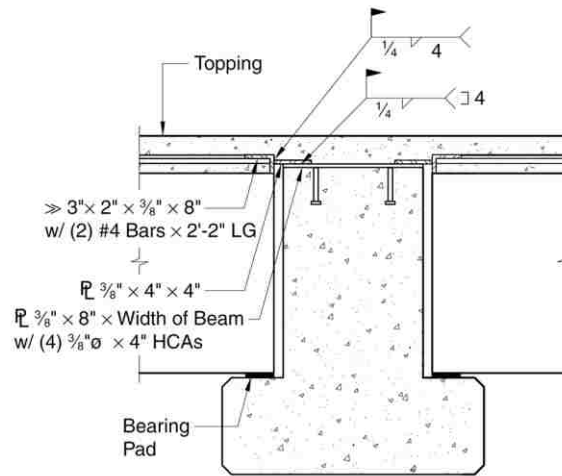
Flange connector welded to stud groups served as anchorage reinforcement
